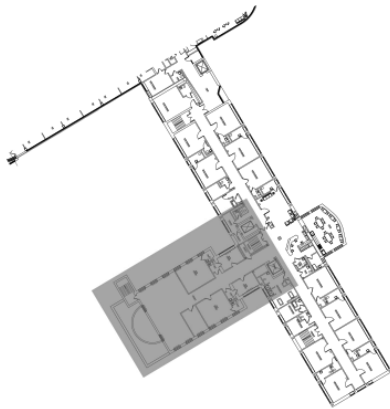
Floor Plan of Fourth Floor Dementia Unit at St. Francis Country House (shaded area Transition Wing). Source: (Author 2010).
